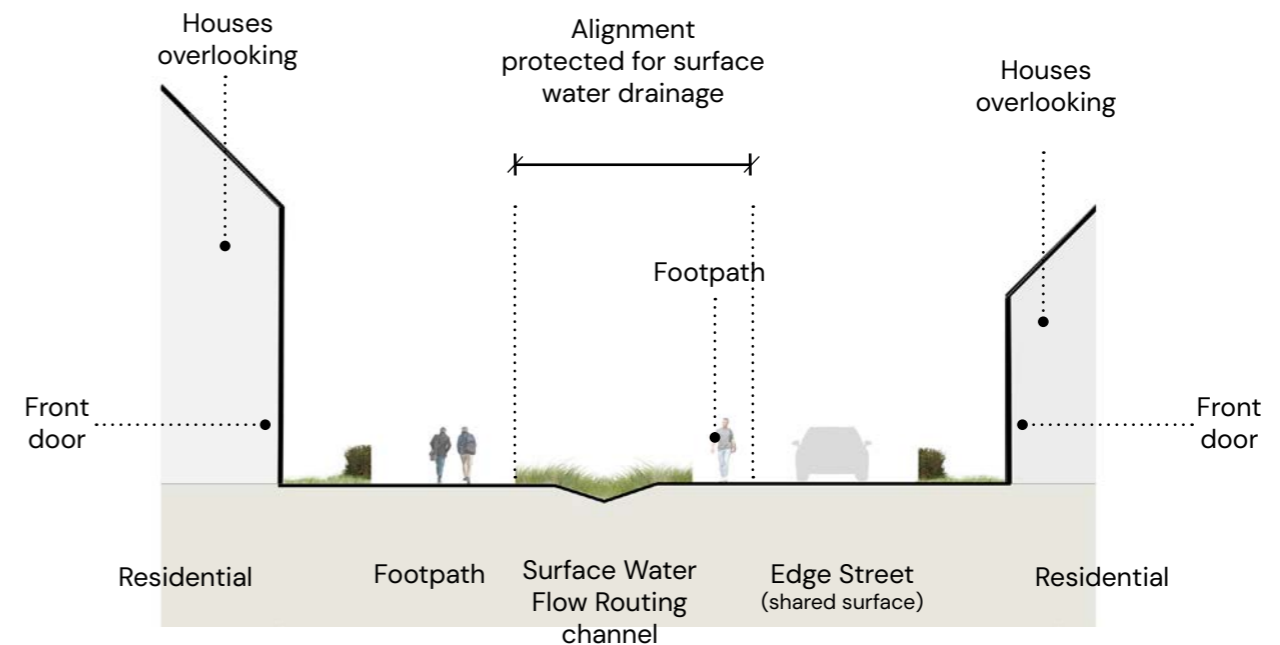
ALIGNMENT PROTECTED FOR SURFACE WATER DRAINAGE ILLUSTRATIVE SECTION
